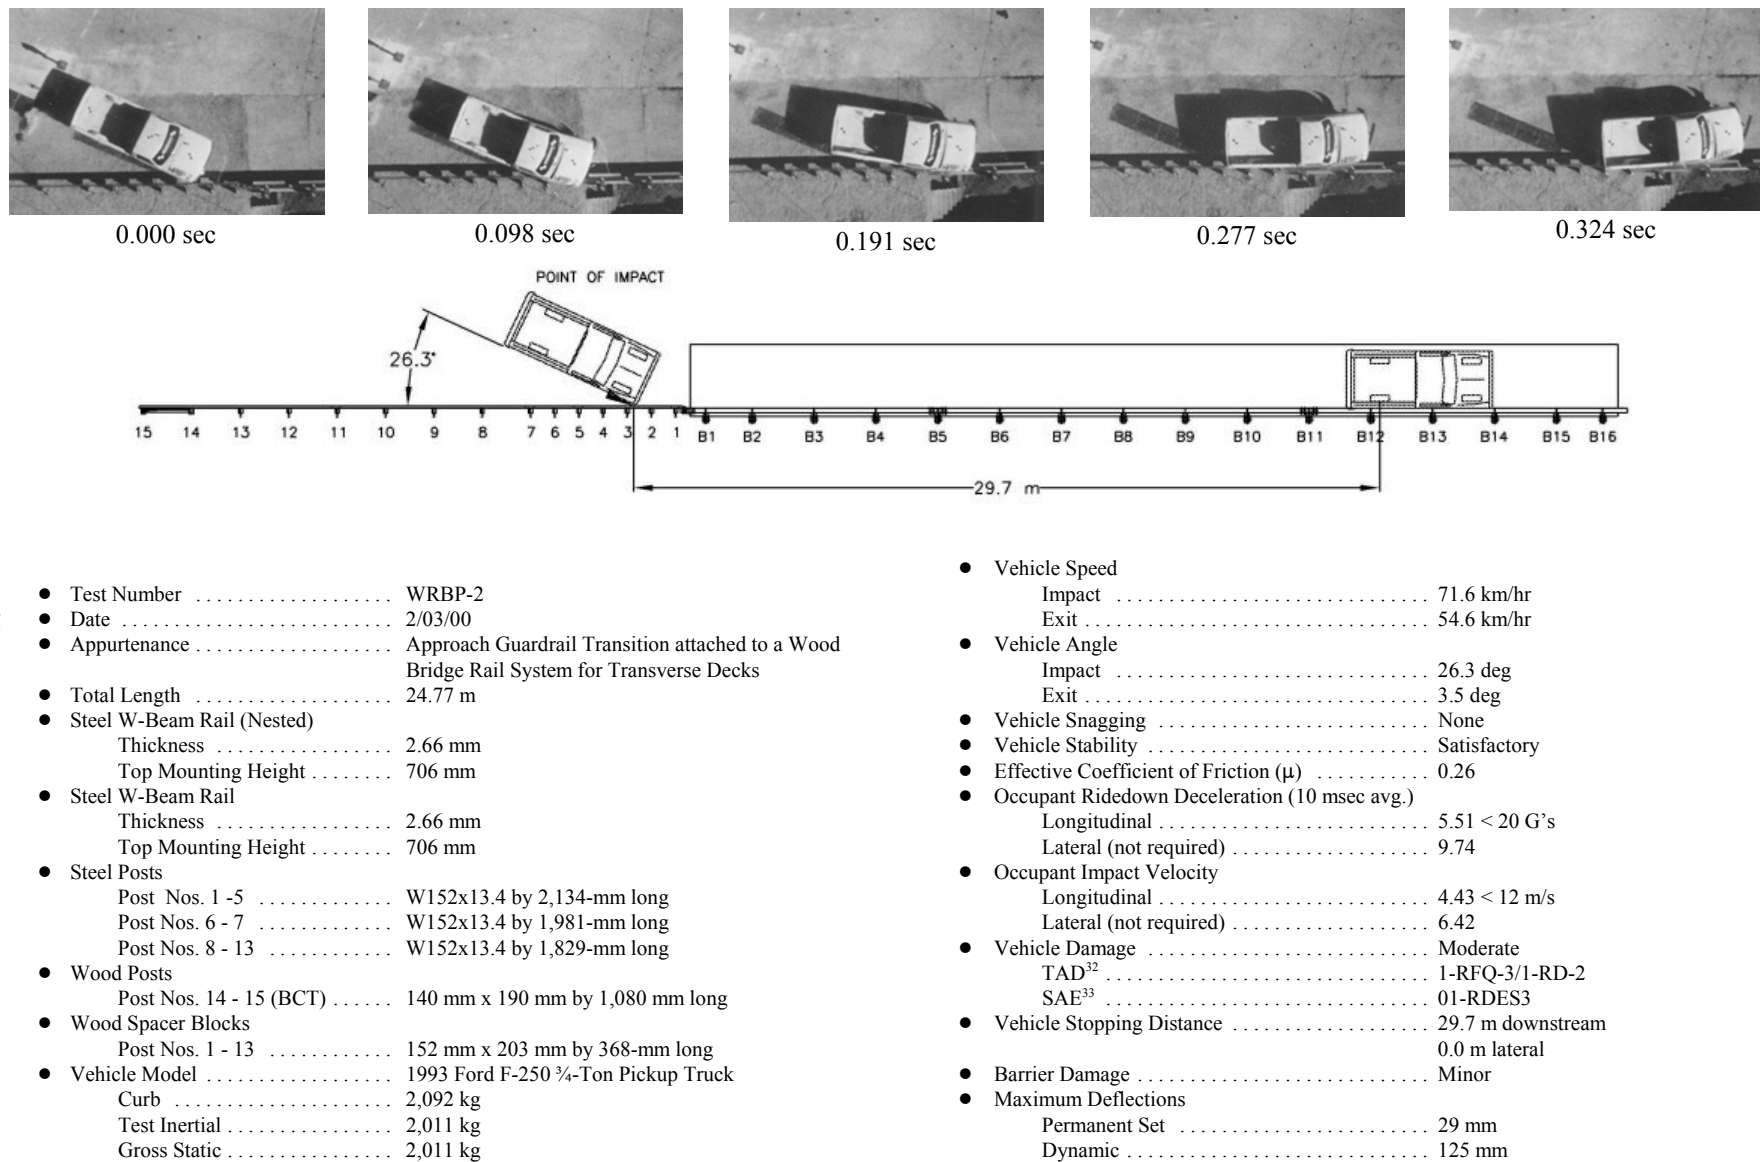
Summary of Test Results and Sequential Photographs, Test WRBP-2
